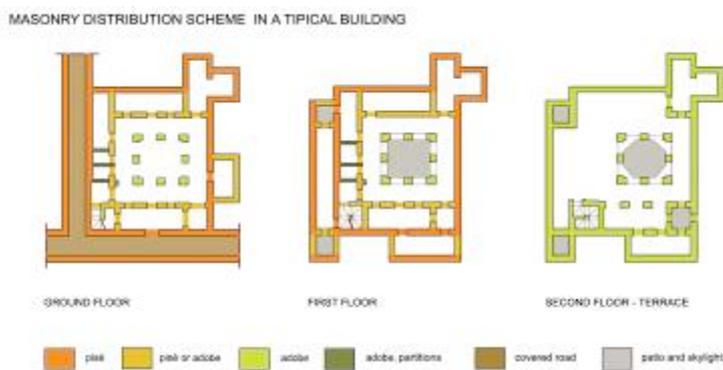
Scheme example of the application of rammed earth and adobe masonry within a building. Case study of Hotel Dar Esseltane in Tissergat, Drâa Valley, Morocco. (credits: Baglioni E., 2009)
